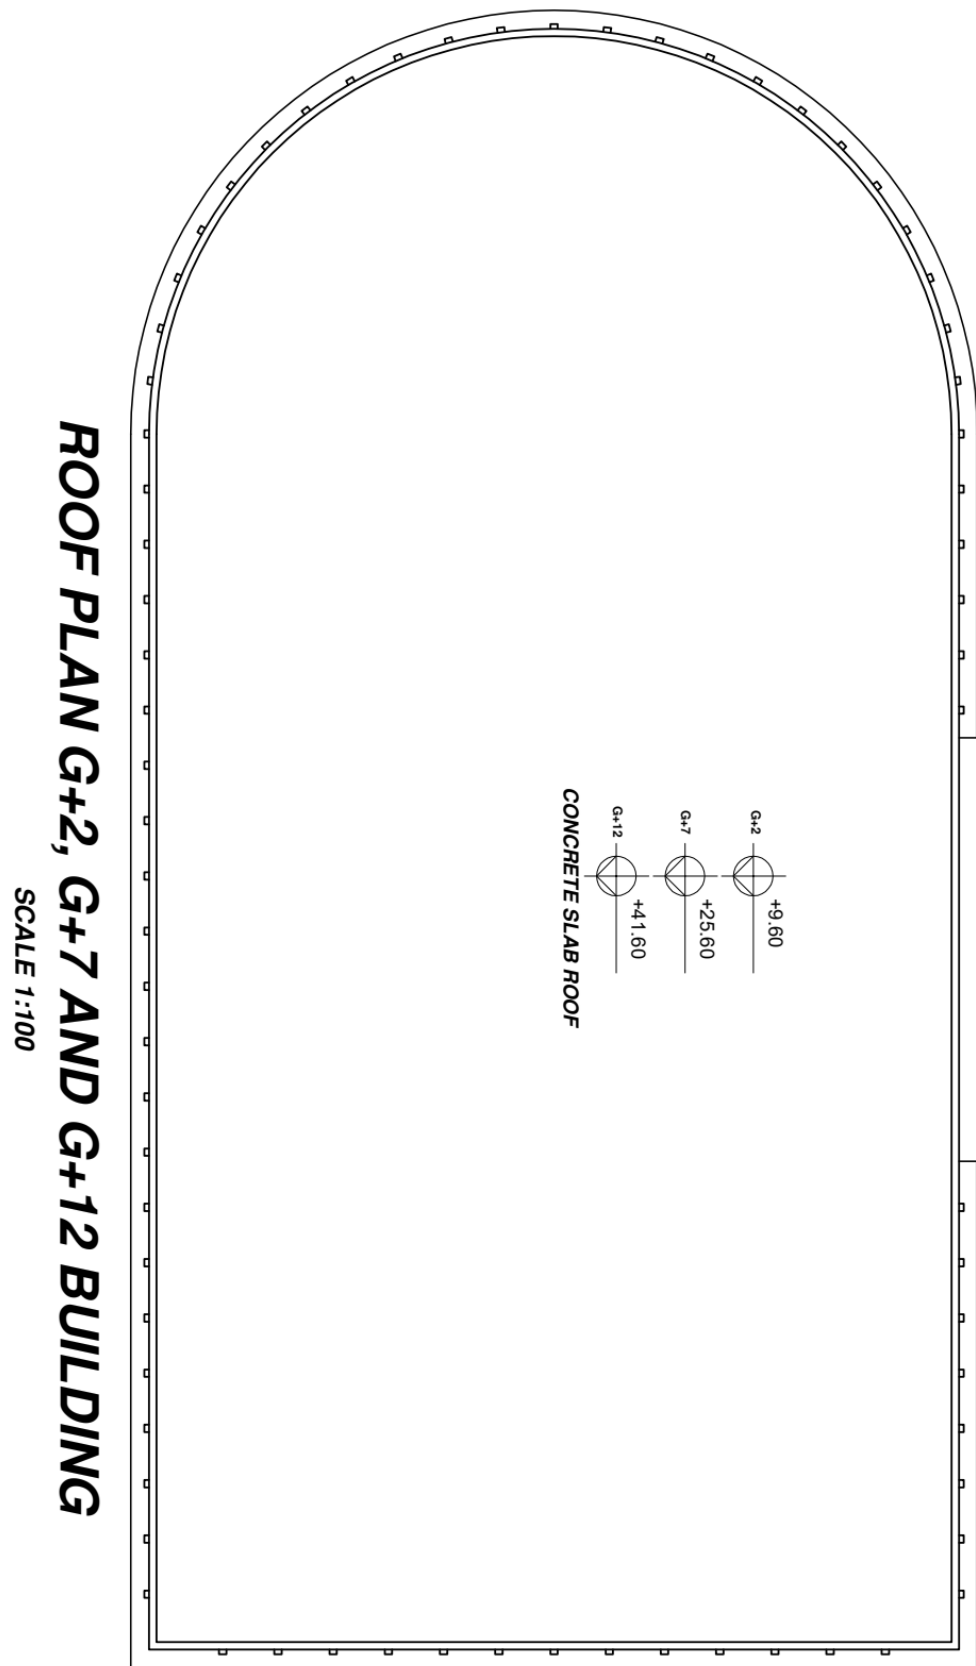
Roof plan for G+2, G+7 and G+12 Buildings
